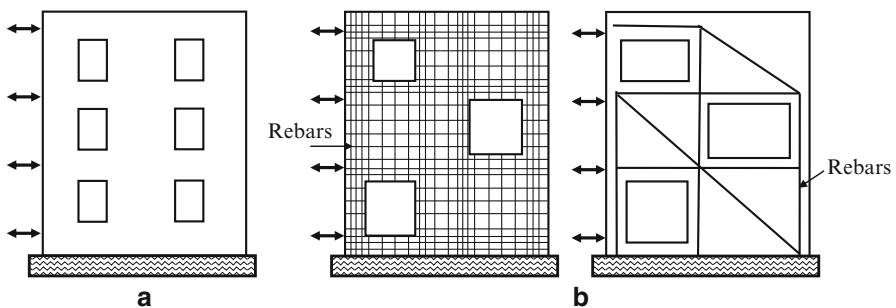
Openings in shear walls. (a) Regular openings. (b) Irregular openings
